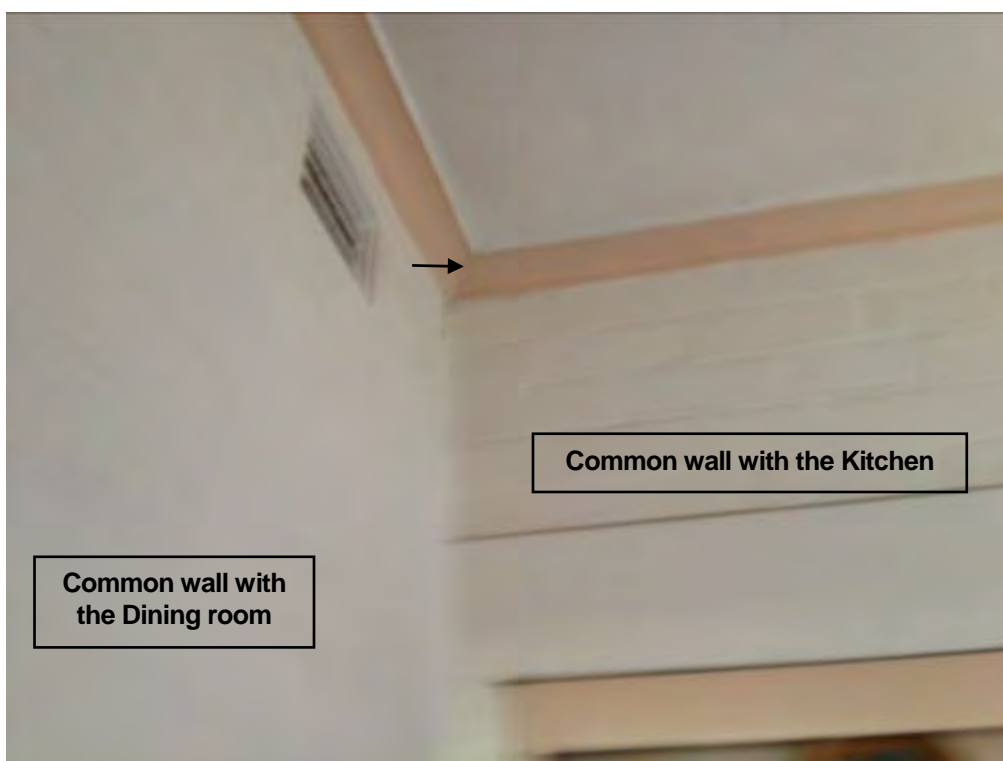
shows the hairline crack to the set joint in the wall lining to the WC.
